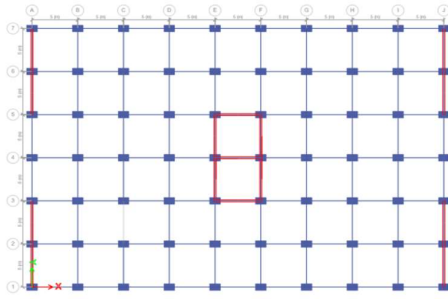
Bare frame model with shear wall along-Y and core wall at center
